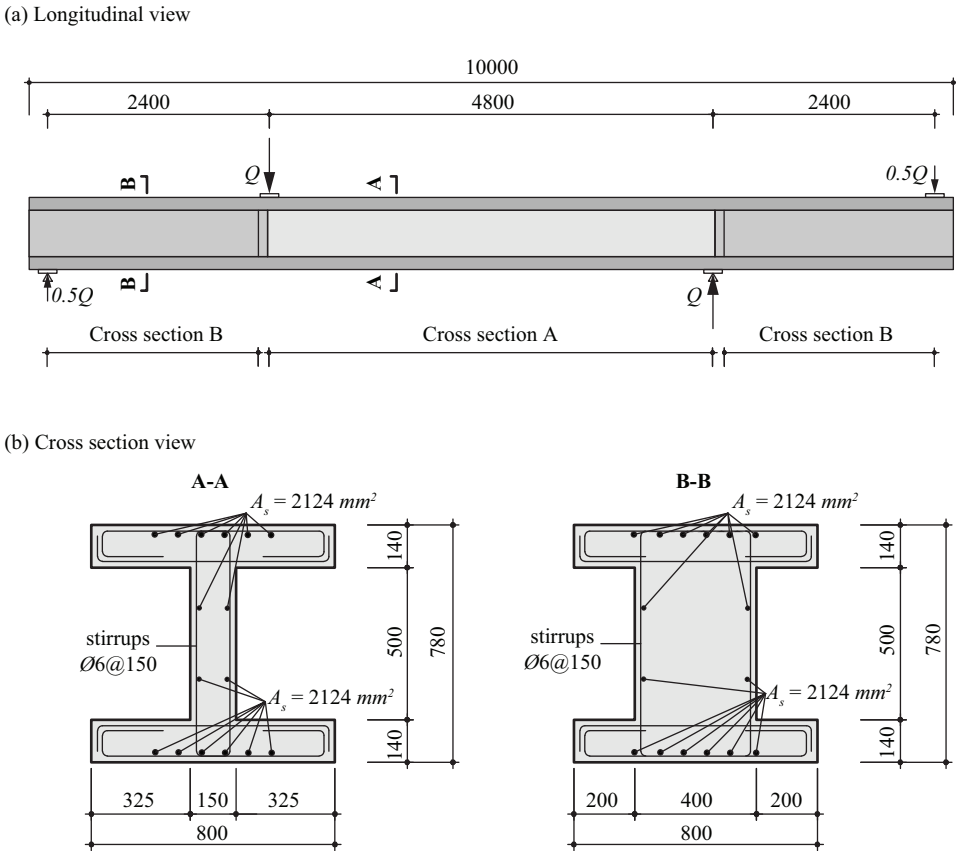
Geometry and reinforcement layout of girder (Unit of dimensions: mm)
